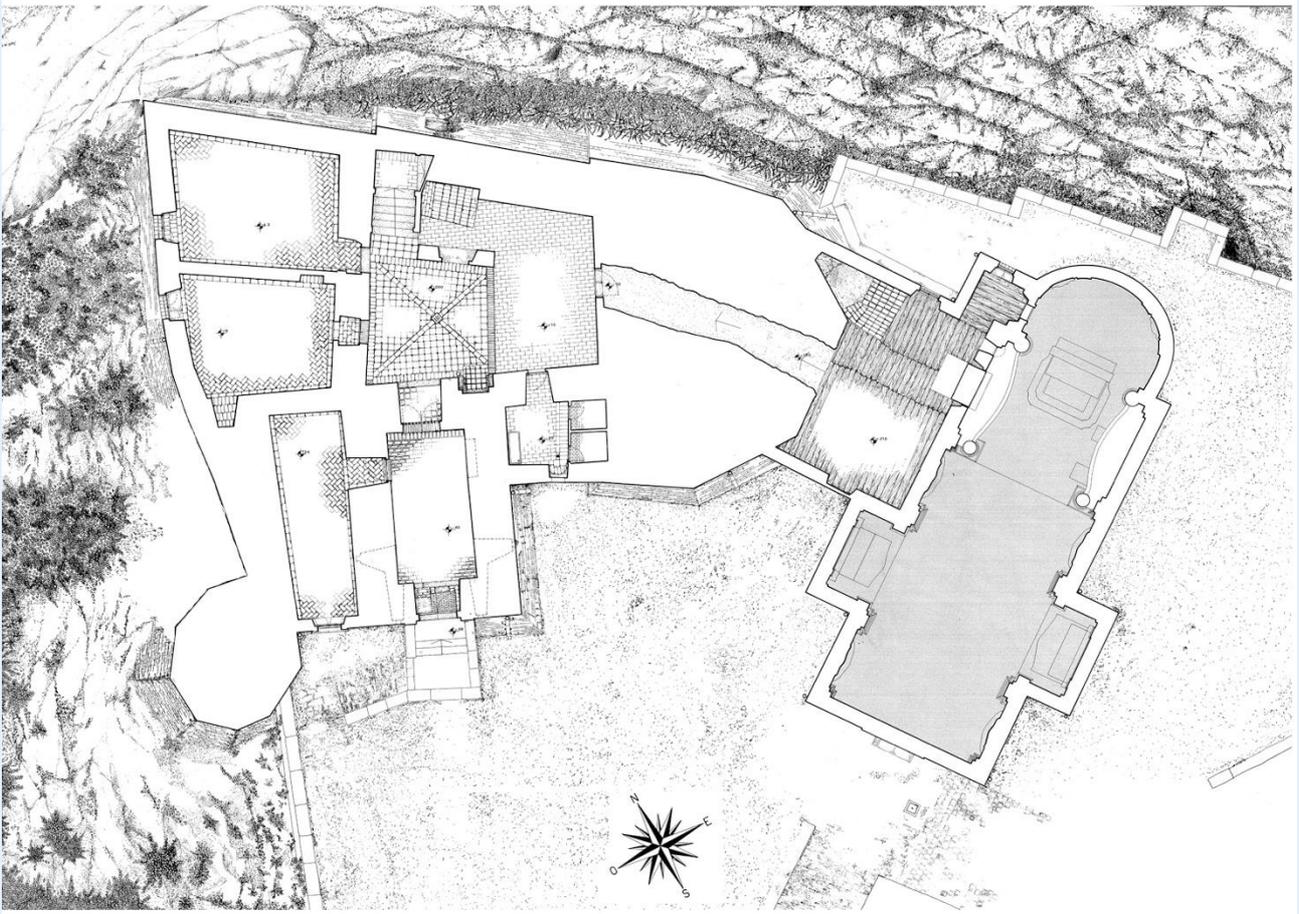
Dimensioned plan of the ground floor. Source: courtesy of prof. Andrea Ugolini (CC BY-NC-SA)
